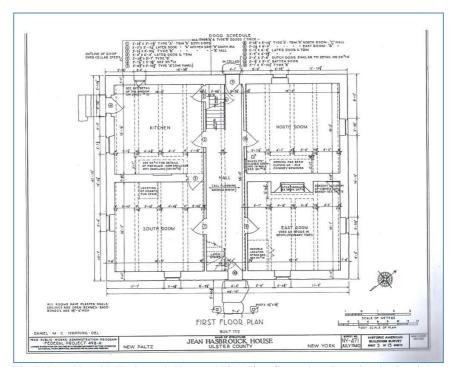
Jean [Jacob] Hasbrouck House, 1721. First floor plan. Drawing by Daniel M.C. Hopping, Historic American Building Survey, 1940.
